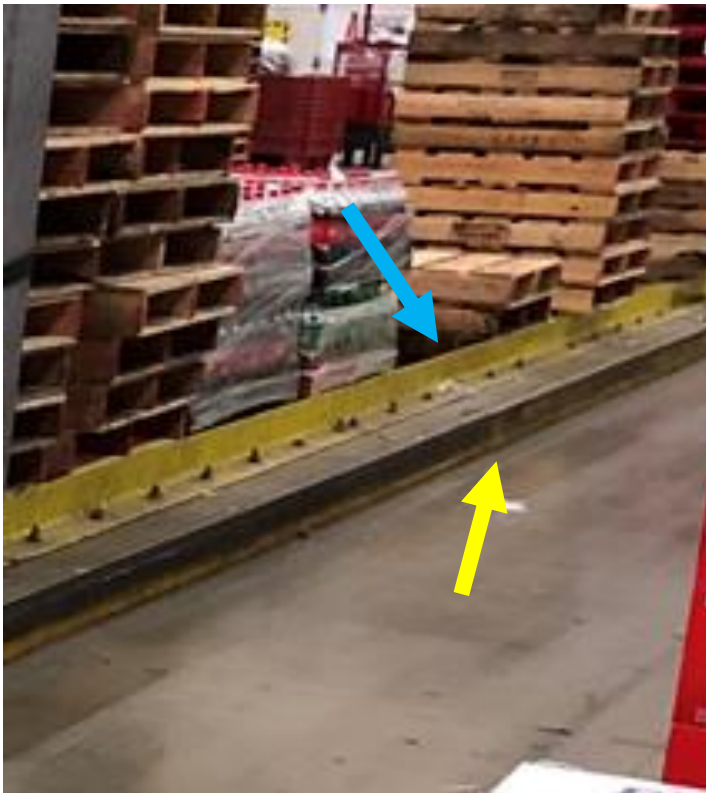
Metal rails installed into concrete floor at the warehouse. Yellow and blue arrows mark end of each row. Rails prevent pulling product from back of adjoining pallet row. Rails were not installed in the area of the warehouse where the incident occurred.
